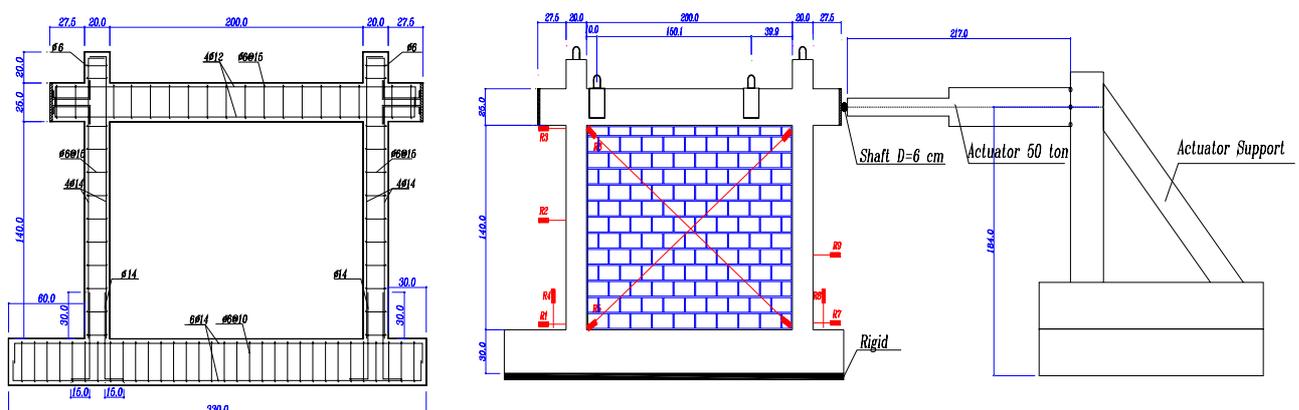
Dimensions(Dimensions are in cm), Reinforcement Details and Specimen Test Setup
